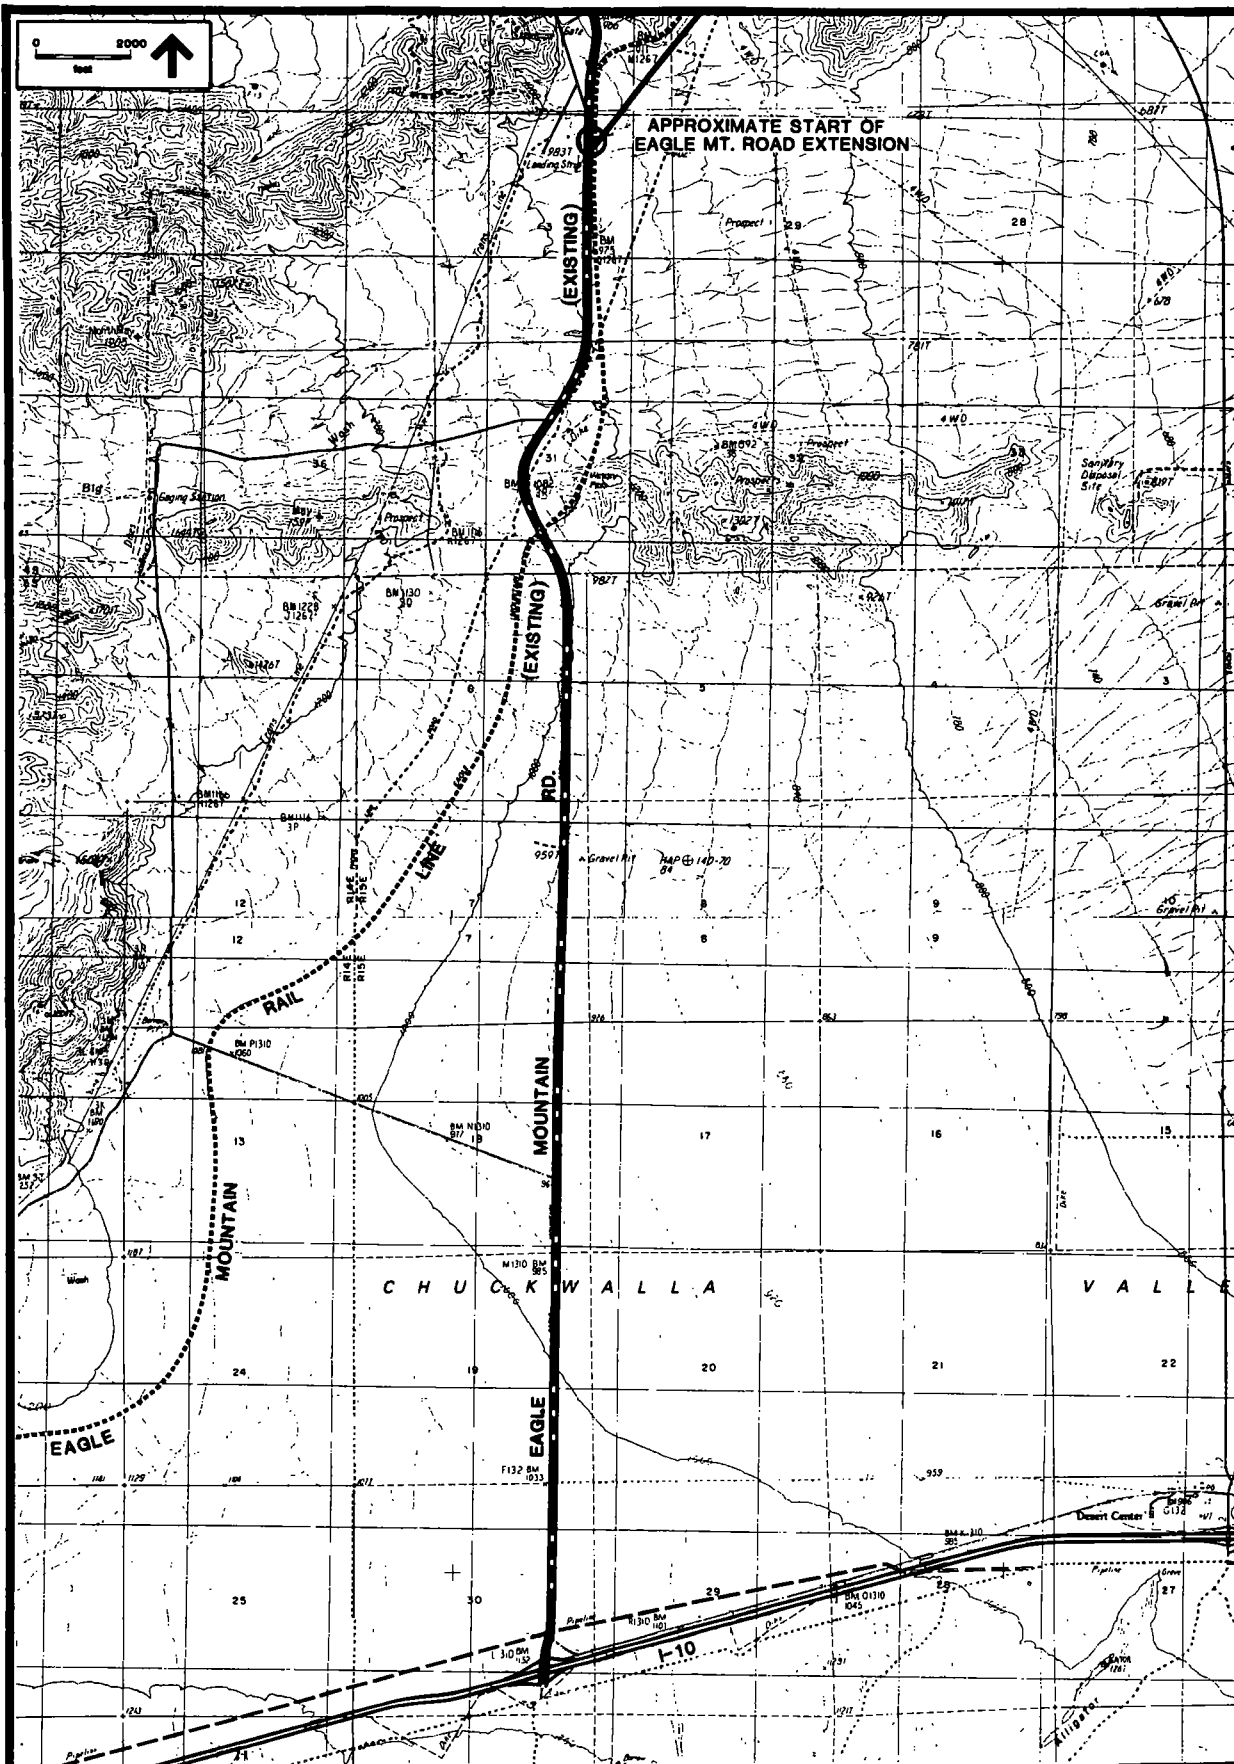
EXISTING EAGLE MOUNTAIN ROAD ALIGNMENT
